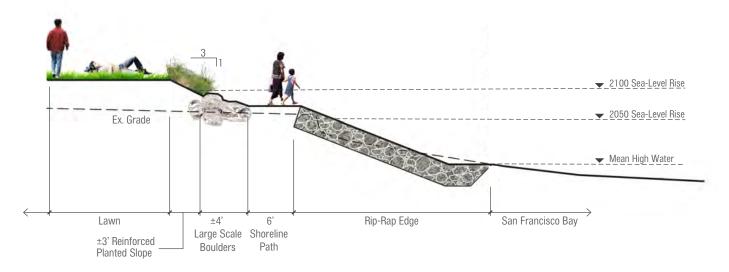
Illustrative Shoreline Section 2 Note: All dimensions and elevations are illustrative only.
